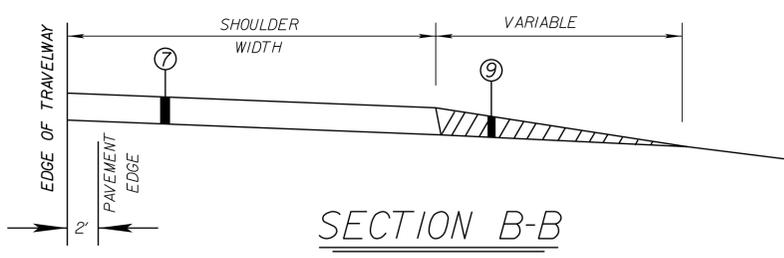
DETAIL OF PAVED SHOULDERS AT BRIDGE ENDS
